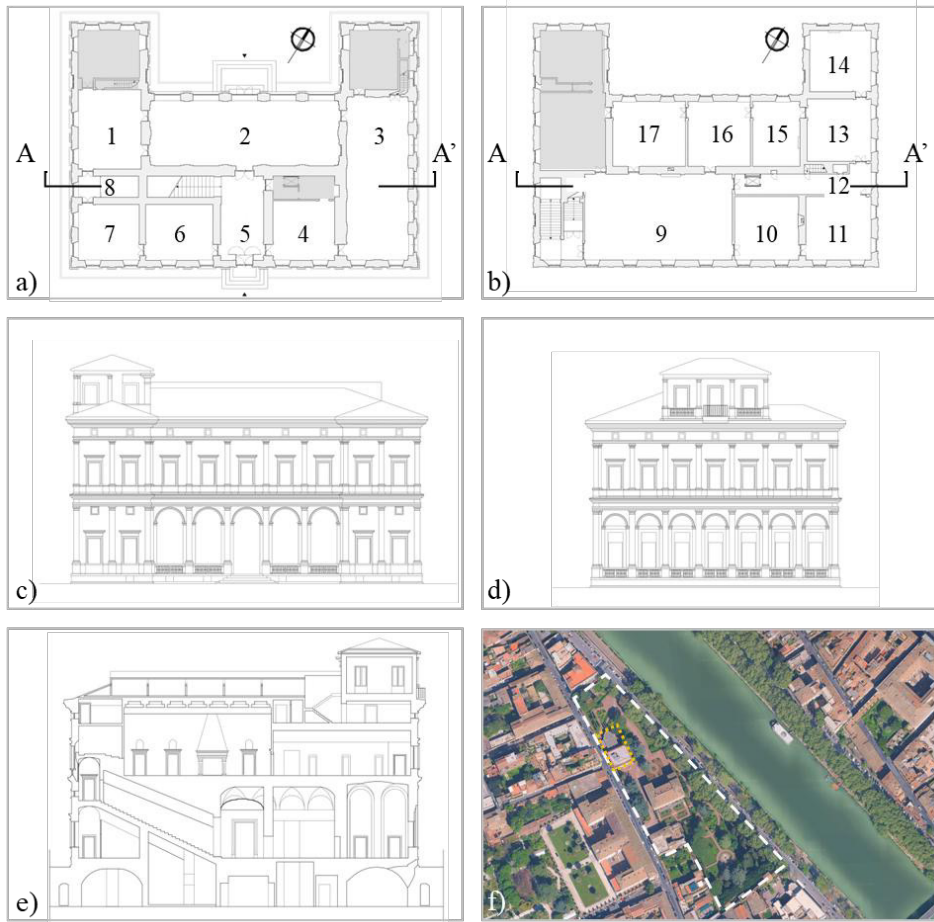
a) Raised ground floor plan: 1. Hall of the Freize, 2. Loggia of Cupid and Psyche, 3. Loggia of Galatea, 4. Museum hall n.1, 5. Atrium, 6. Bookshop, 7. Museum hall n. 2, 8. Pompeian Room. The grey areas are closed to the public; b) First floor plan: 9. Hall of the Perspectives, 10. Wedding Hall, 11. museum hall n. 3, 12. Gallery of Grottesque, 13, museum hall n. 4, 14. museum hall n.5, 15. museum hall n.6, 16. museum hall n.7, and 17. museum hall n. 8. The grey areas are closed to the public; c) NNW façade; d) NNE façade; e) cross section AA', f) Aerial view of Villa Farnesina complex, identified with dashed perimeter; in yellow the Auditorium building.
